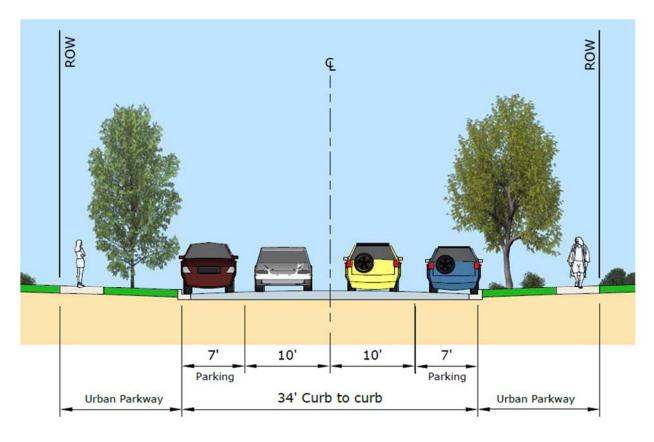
SECTION A-A: TWO LANE SUB-COLLECTOR
